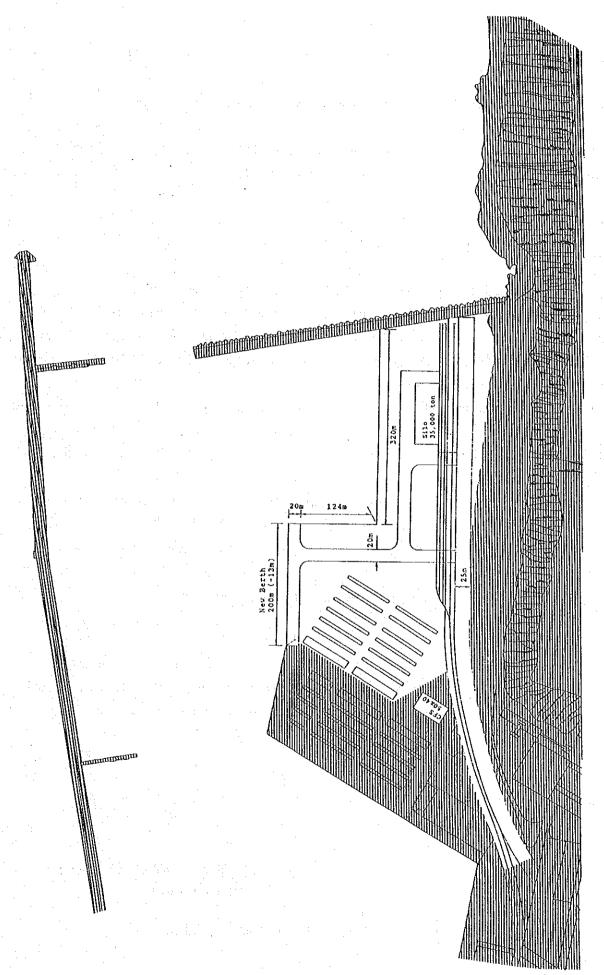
The Layout of the New Facilities in the Short-Term Plan
